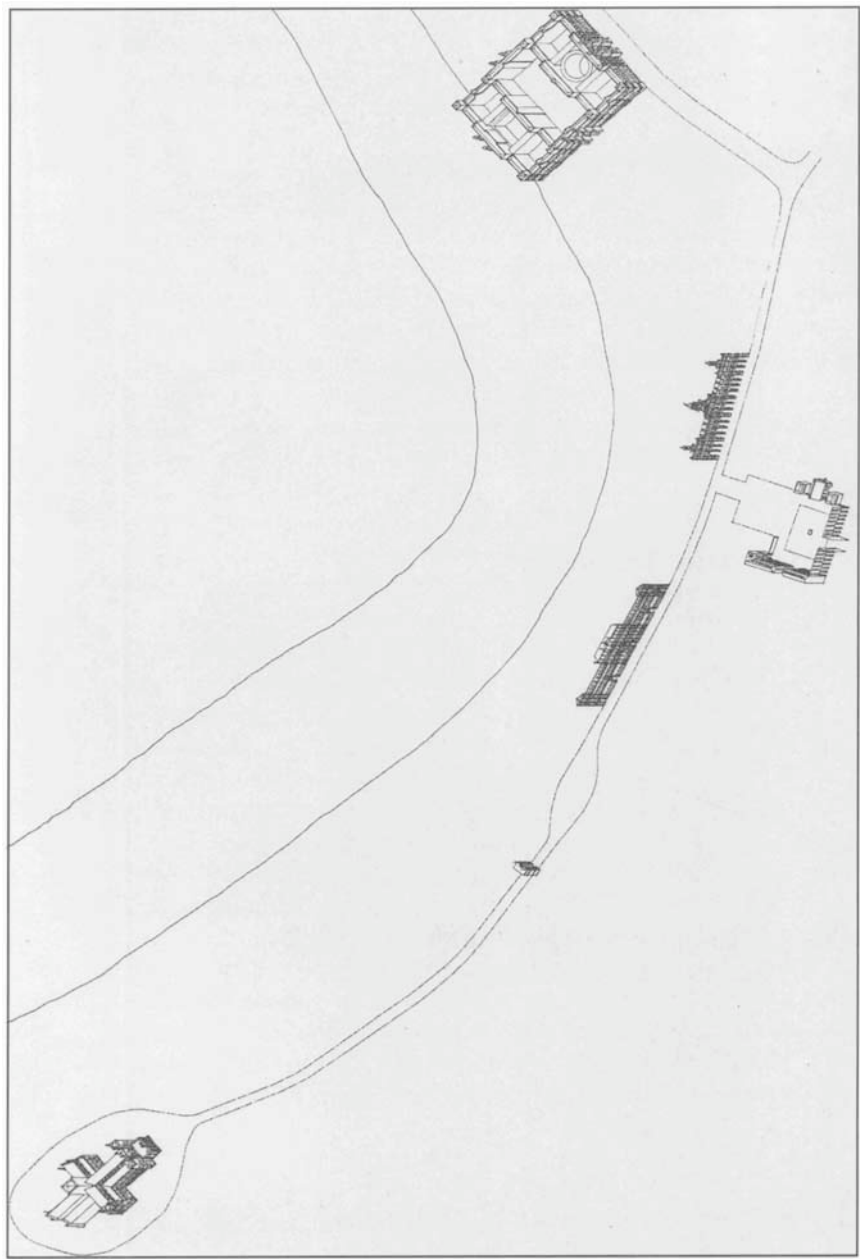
Reconstruction of Inigo Jones's façades along the triumphal route, from palace (right) to temple (left) Whitehall Palace (as planned, part built), New Exchange façade (as planned), Covent Garden Piazza (as built, connecting road possibly planned), Somerset House façade (as planned), Arch at Temple Bar (as planned), old St Paul's (as built).
